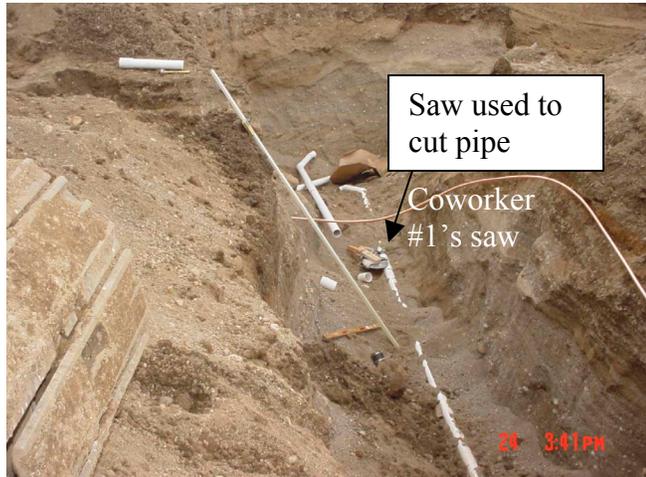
Location of Coworker #1 in trench cutting pipe when trench wall collapse occurred
